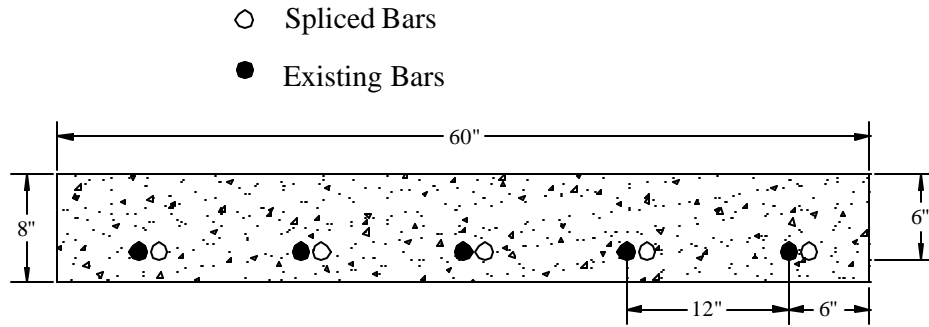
Test Series 1-3, Specimen A reinforcement spacing and depth
